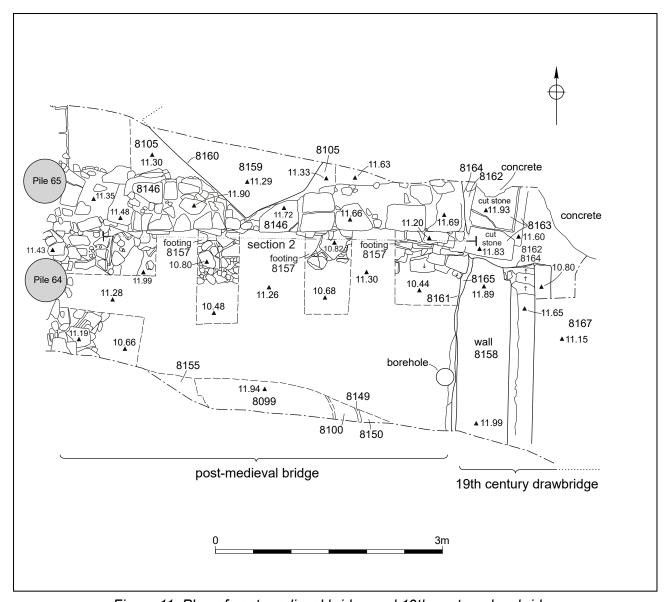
Plan of post-medieval bridge and 19th century drawbridge
